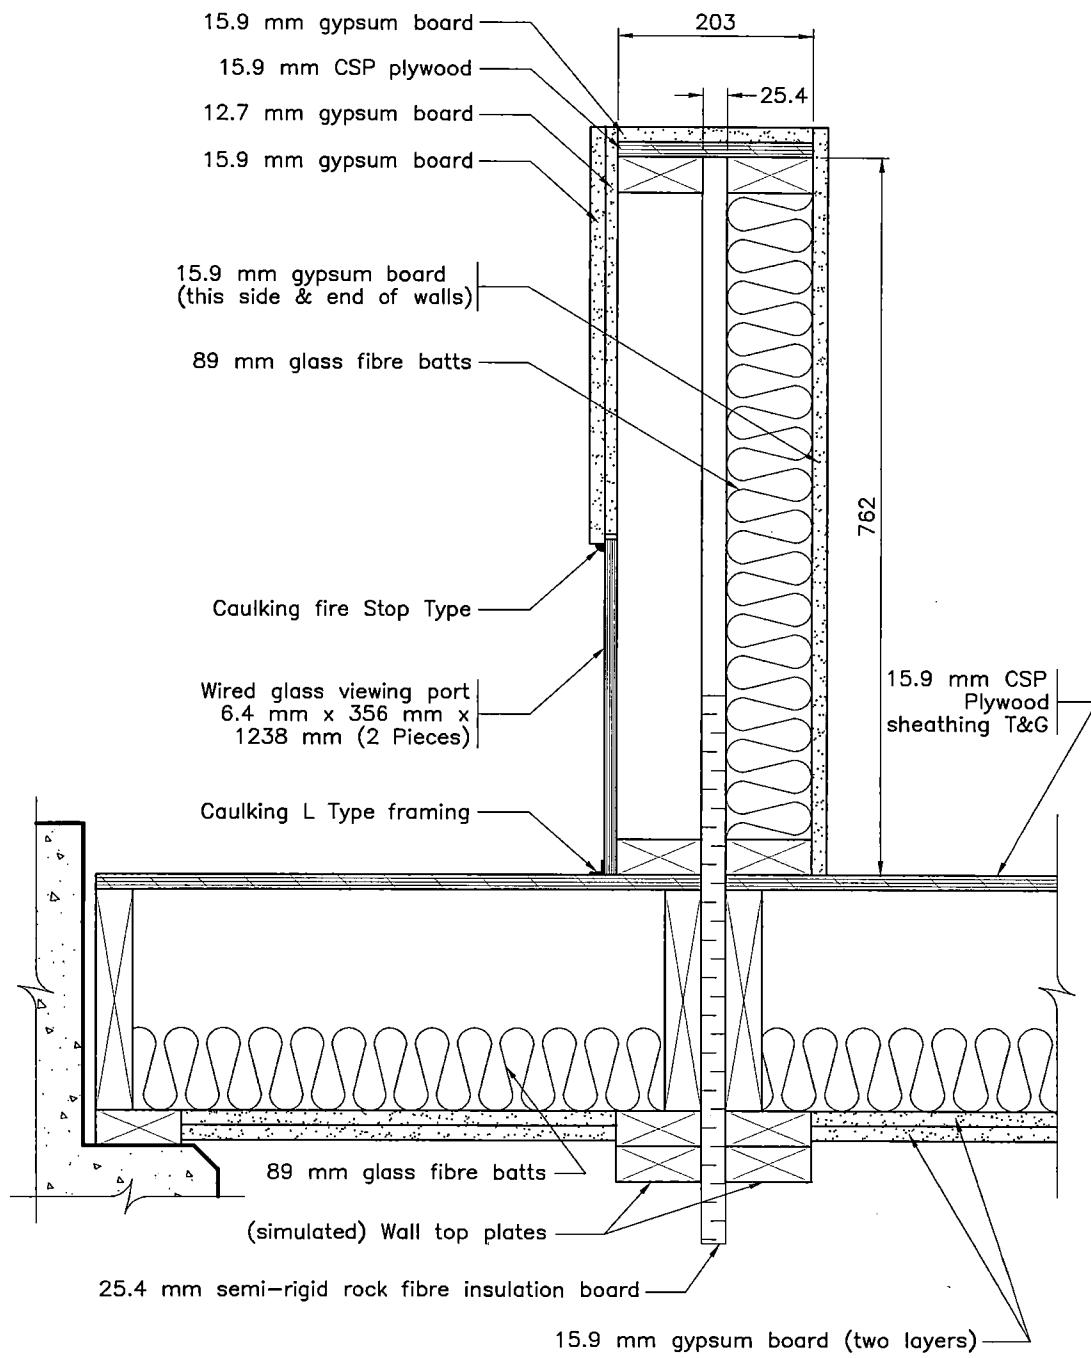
Assembly No. 1, Wall No. 1 Layout (Section A-A)
